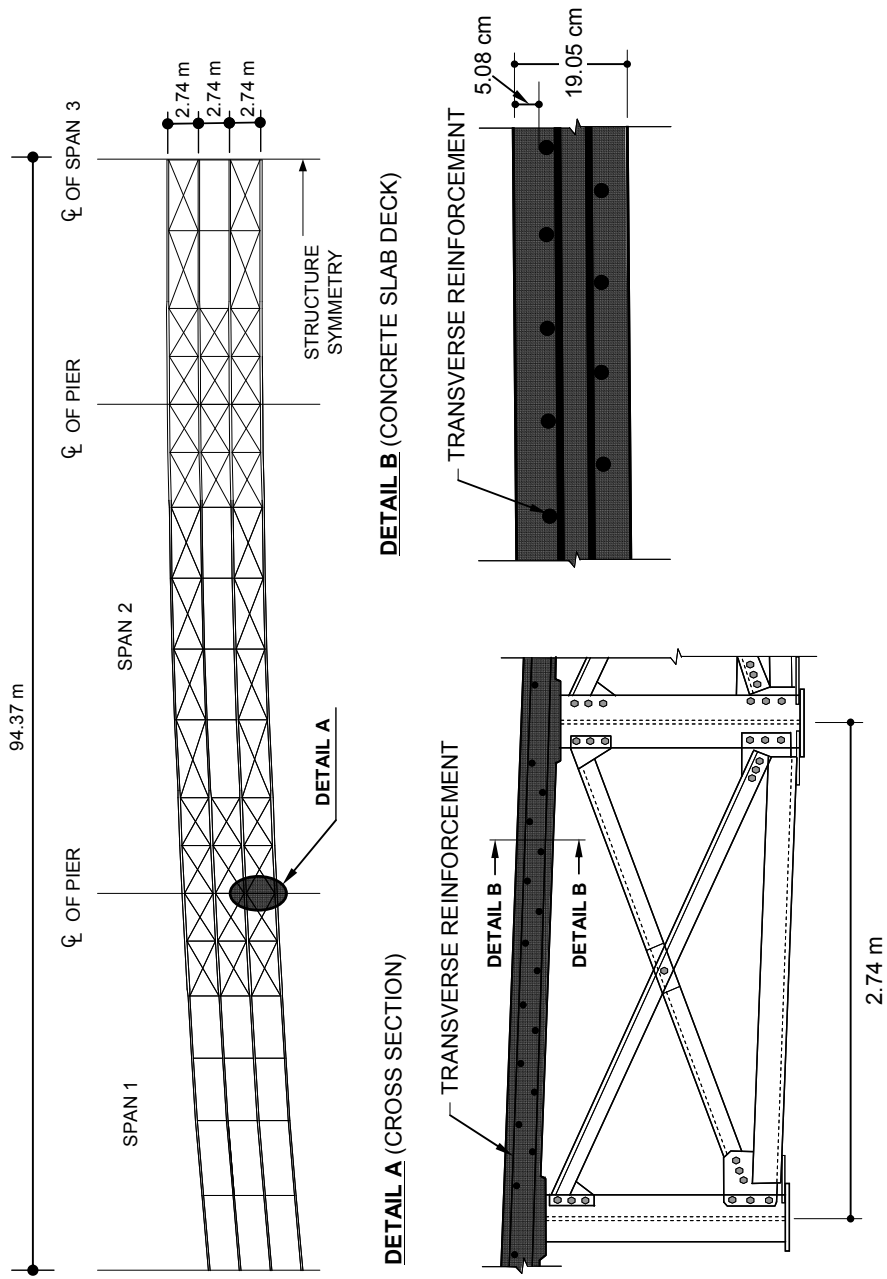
I-39 Northbound Wisconsin River Bridge: top view, cross sectional view (Detail A), and concrete slab (Detail B)
